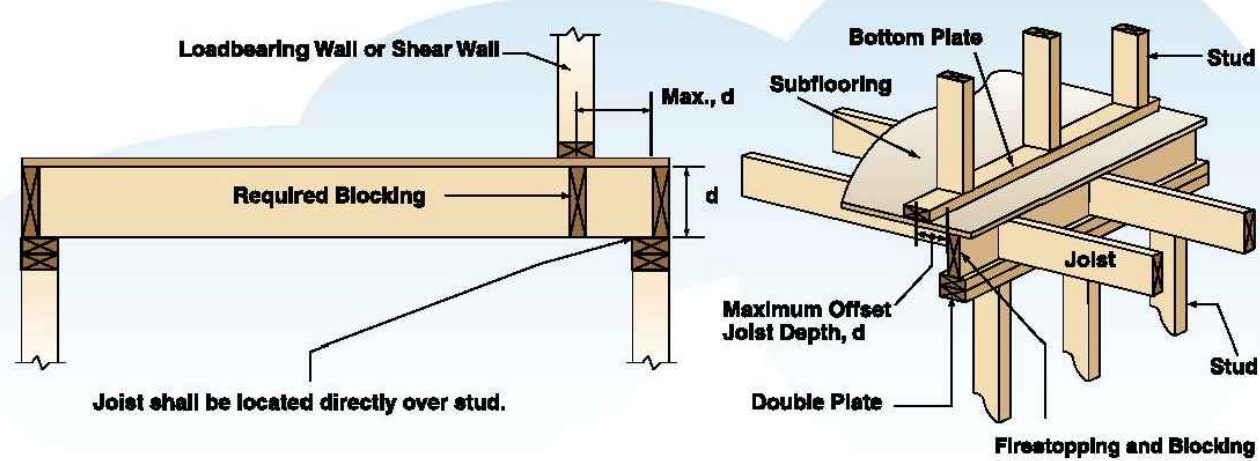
Setback Limits for Loadbearing Wall or Shear Wall and Limit on Loadbearing Wall Offset from Support
